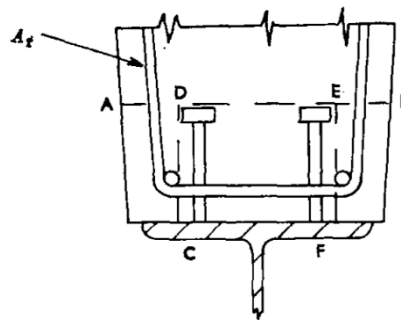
Haunch Reinforcement Illustration (Johnson 1972)
